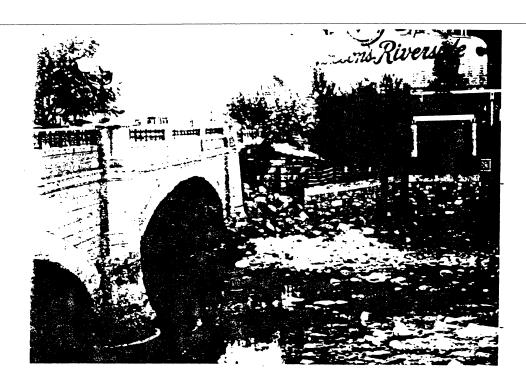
WEST FACE OF BRIDGE AND RIVERWALK DEVELOPMENT
